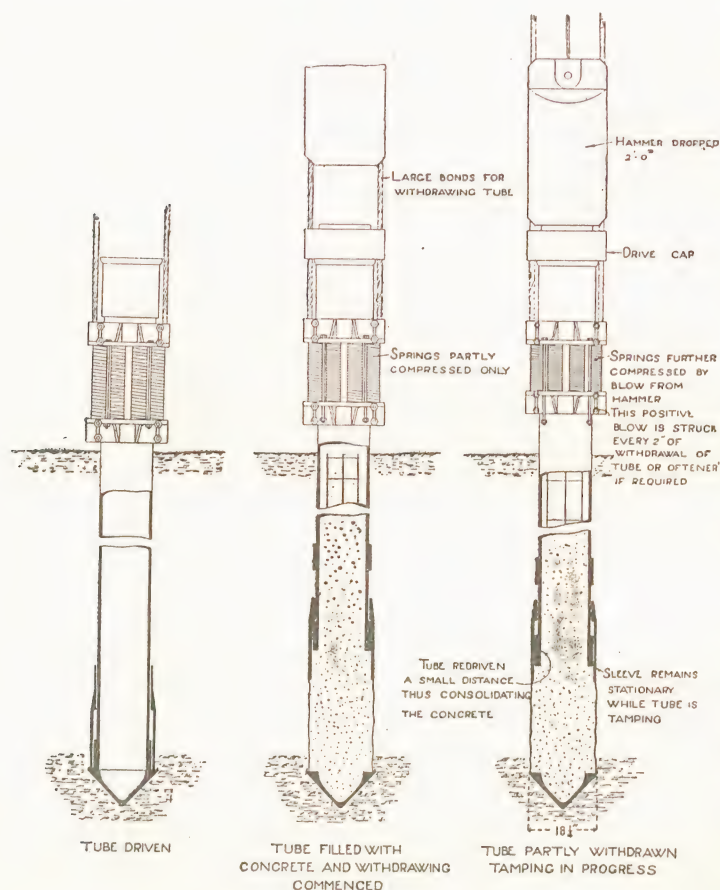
Fig. III.—Method of installing "Tamped" Simplex Concrete Pile.
